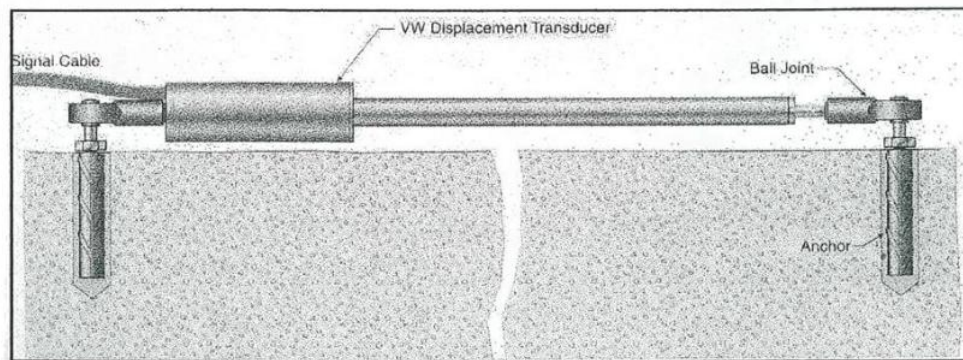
Schematic of long range crackmeters installed at Bath Road and Newport Road (after Dias, 2002)
